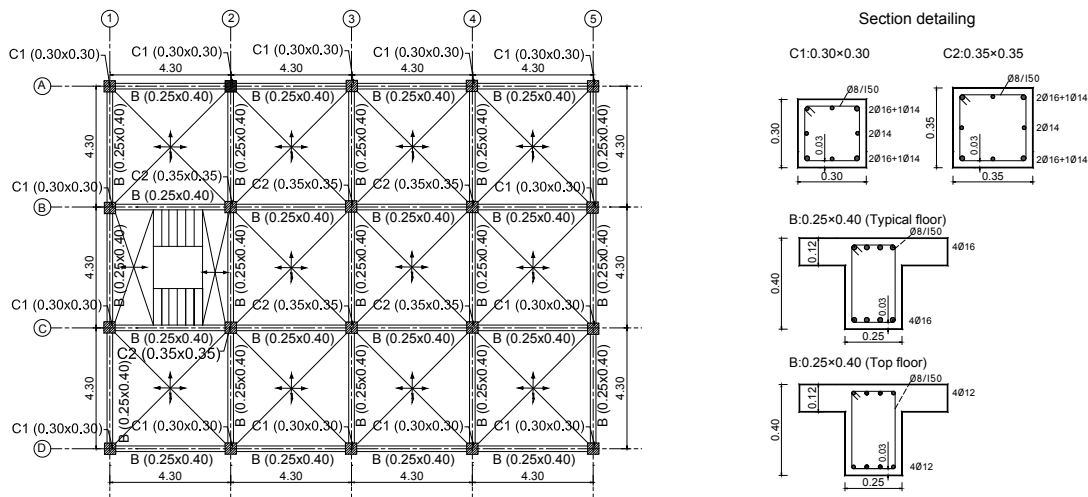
Plan view of a typical storey of the 3-R, 4-R and 5-R buildings and the design details (all dimensions are in m).
